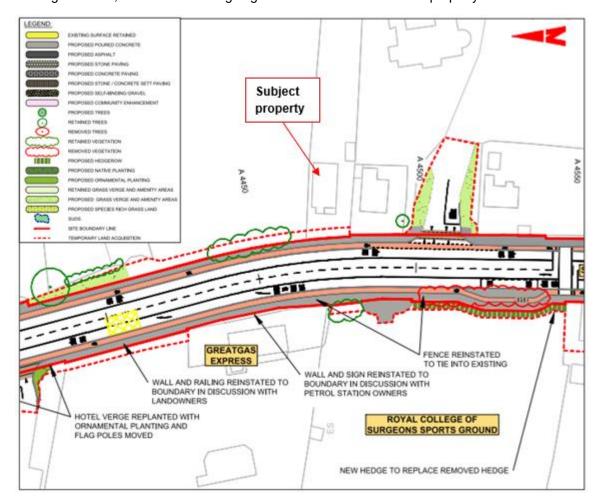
Extract of Landscape General Arrangement Drawing (Sheet 13)
